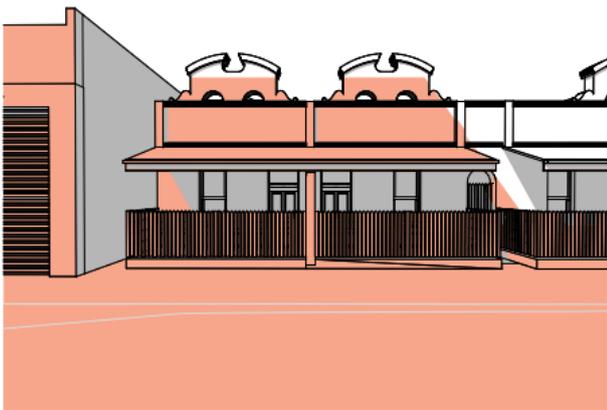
Excerpt Drawing TP5-107 (Fieldwork)
